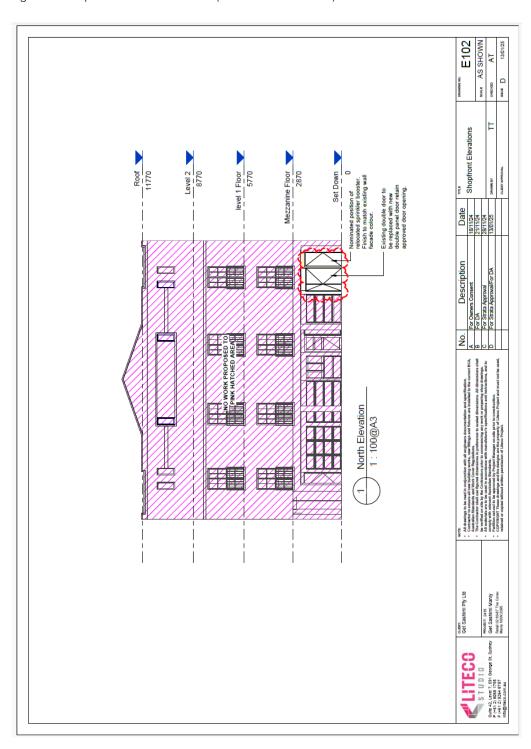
Proposed northern elevation (Source: LiteCo Studio)
